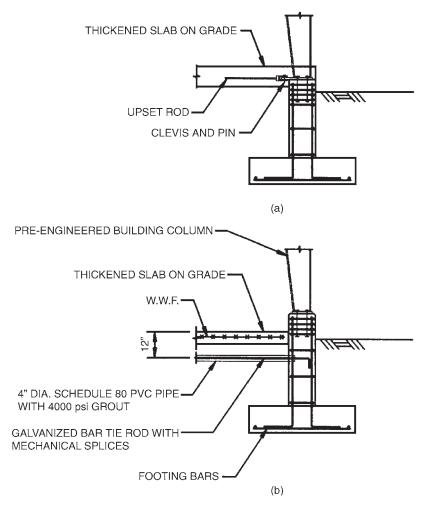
Foundations with tie rods: (*a*) tie rod connected to base plate; (*b*) tie rod embedded in column pier.
